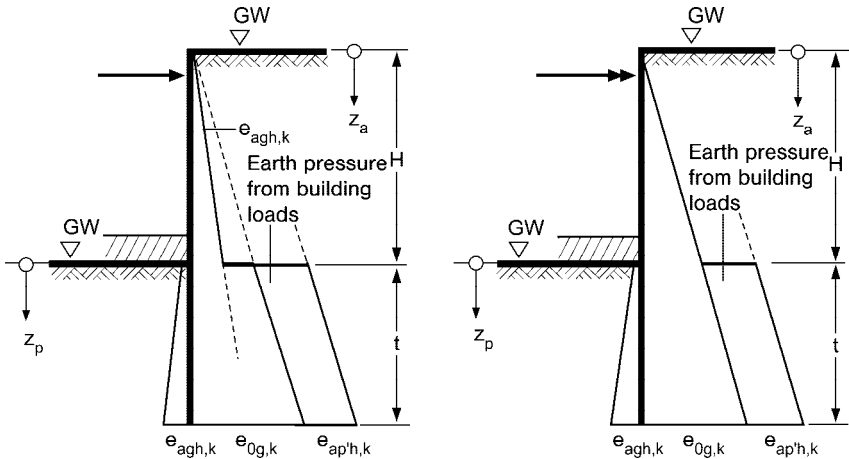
Possible load diagrams for single-propped walls without support at the excavation level
